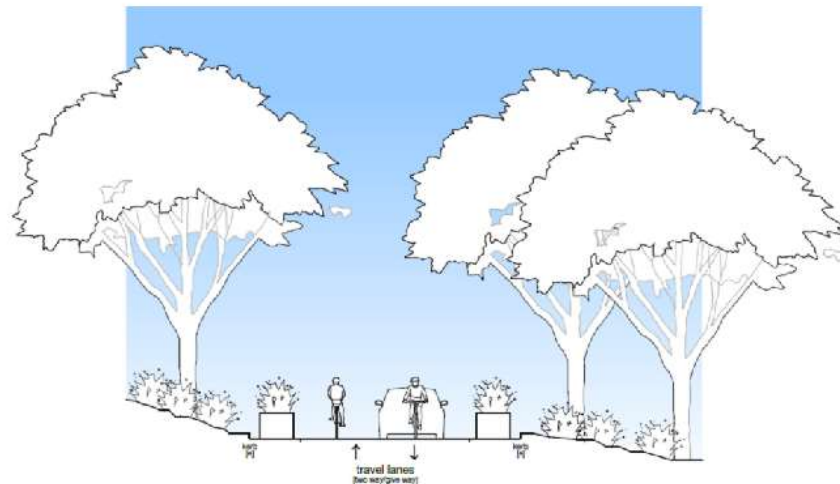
Proposed cross-section for The Serpentine (two-way give way)
